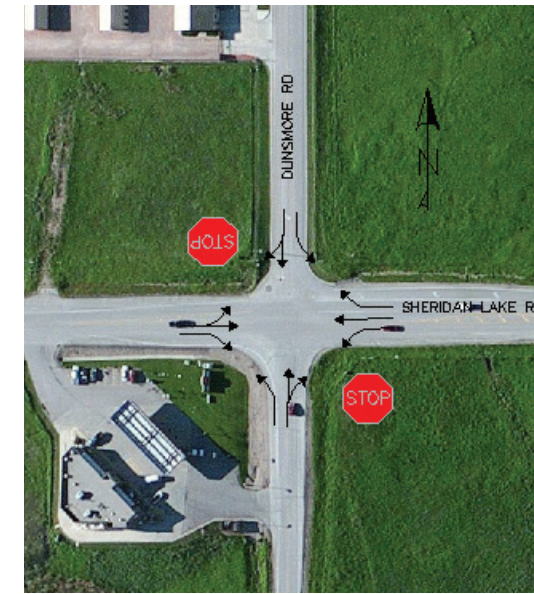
Dunsmore Road & Sheridan Lake Road Intersection Configuration
